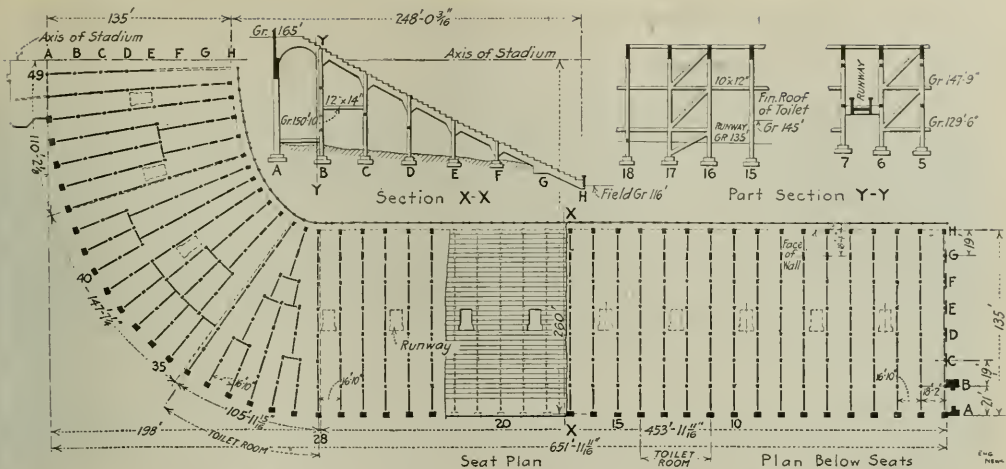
HALF PLAN AND DETAILS OF REINFORCED-CONCRETE STADIUM AT PRINCETON UNIVERSITY
